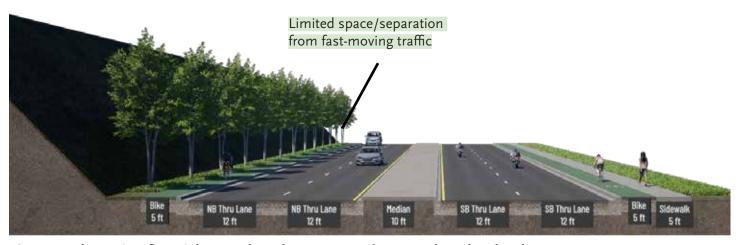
Alternatives for Rainbow Boulevard Between Southwest Boulevard and 39th Avenue
